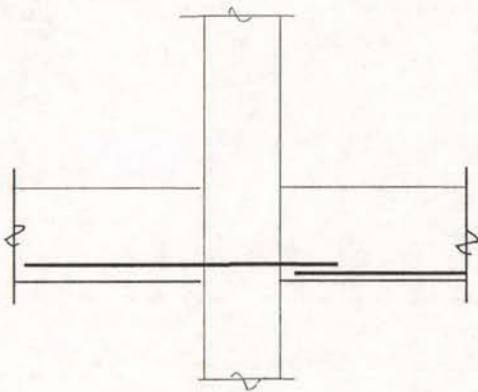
Lap splice of beam longitudinal bars in plastic hinge regions
